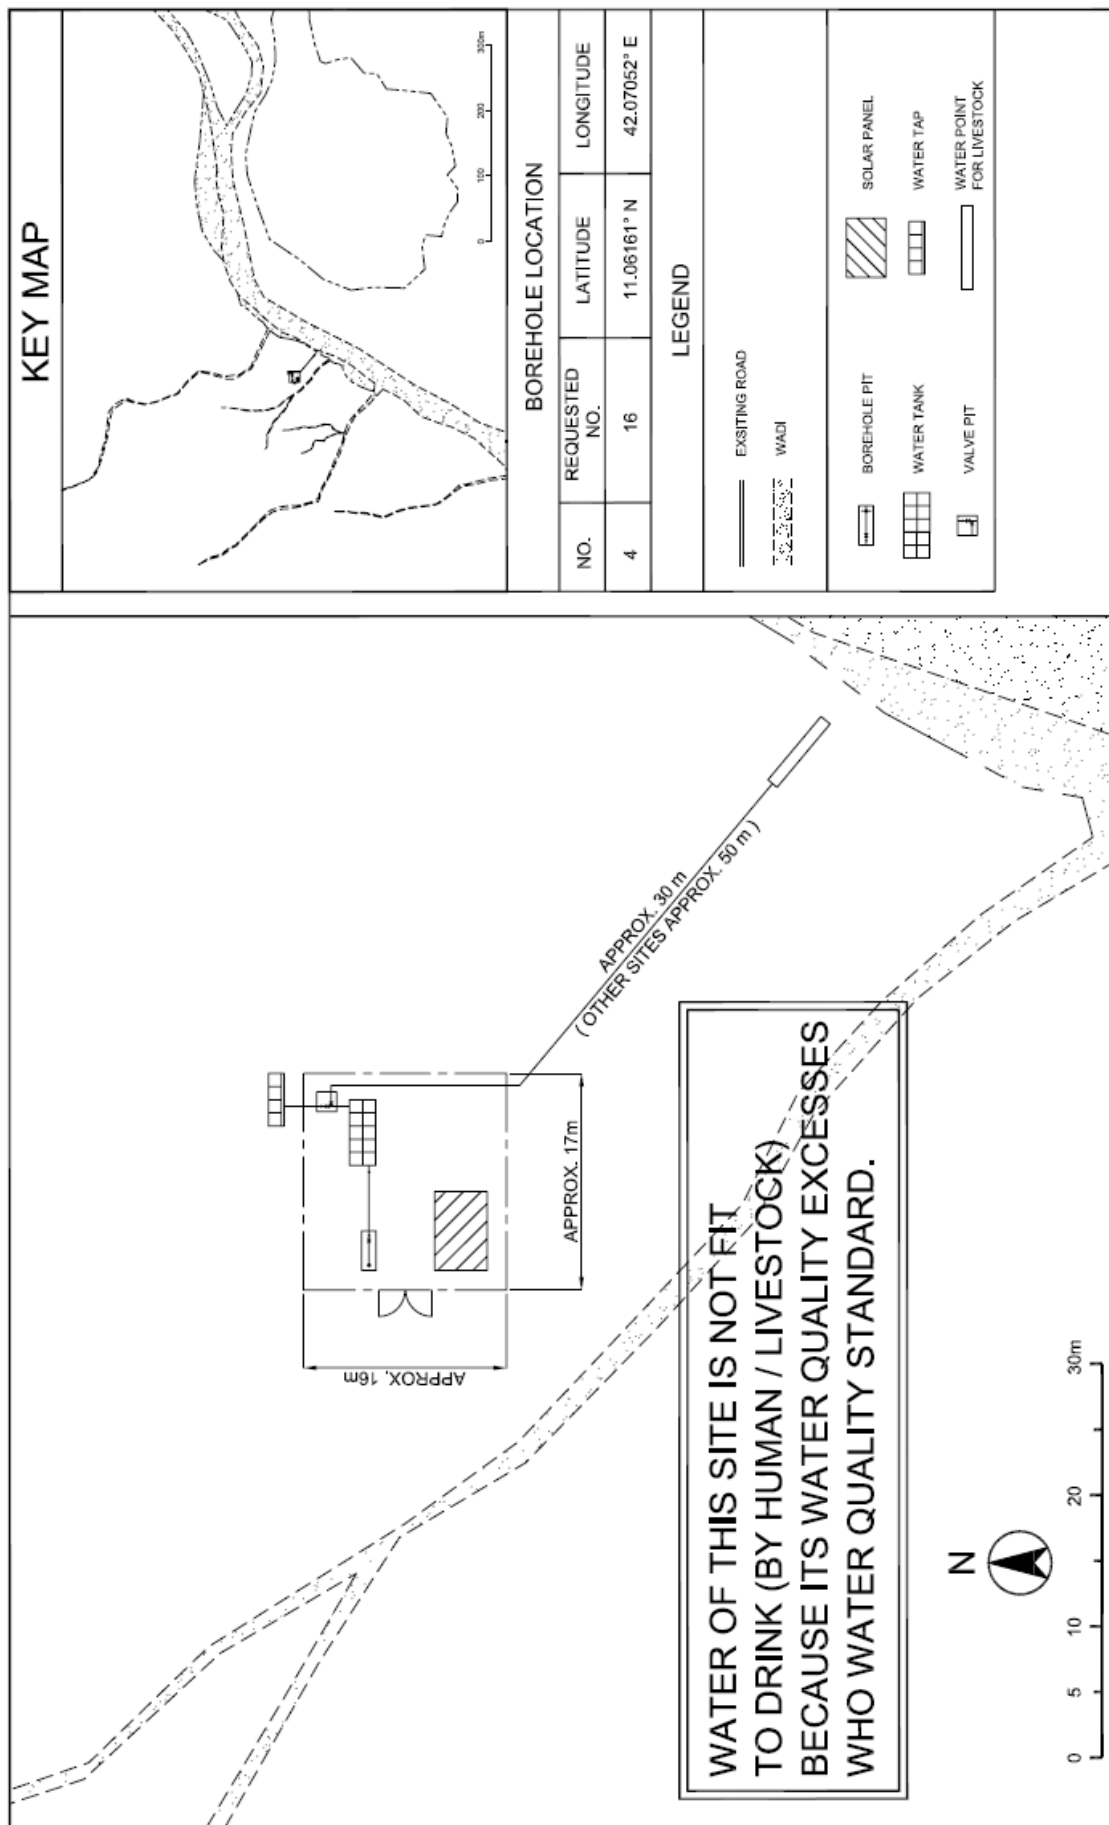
Layout of Facility (5) [Asa Koma]
